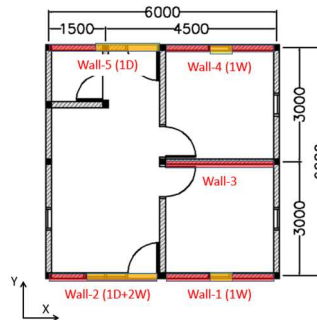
Layout of Type-36 House (Permen PUPR 5/2016)
